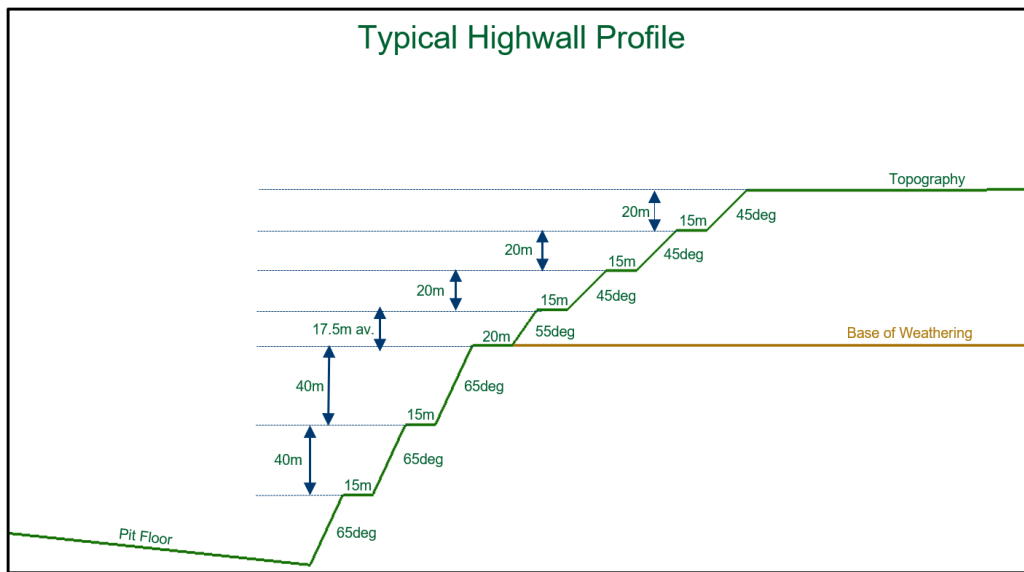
Generic Cut Slope Design for Highwalls and End Walls
